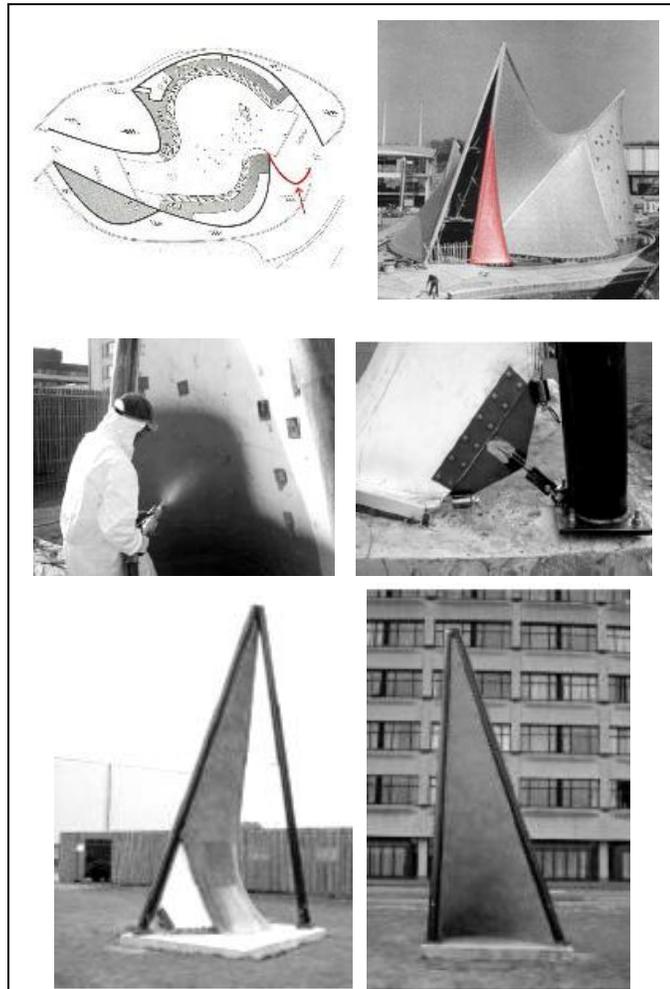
Pronk, A., Bullens, T., Folmer T. (2007).
